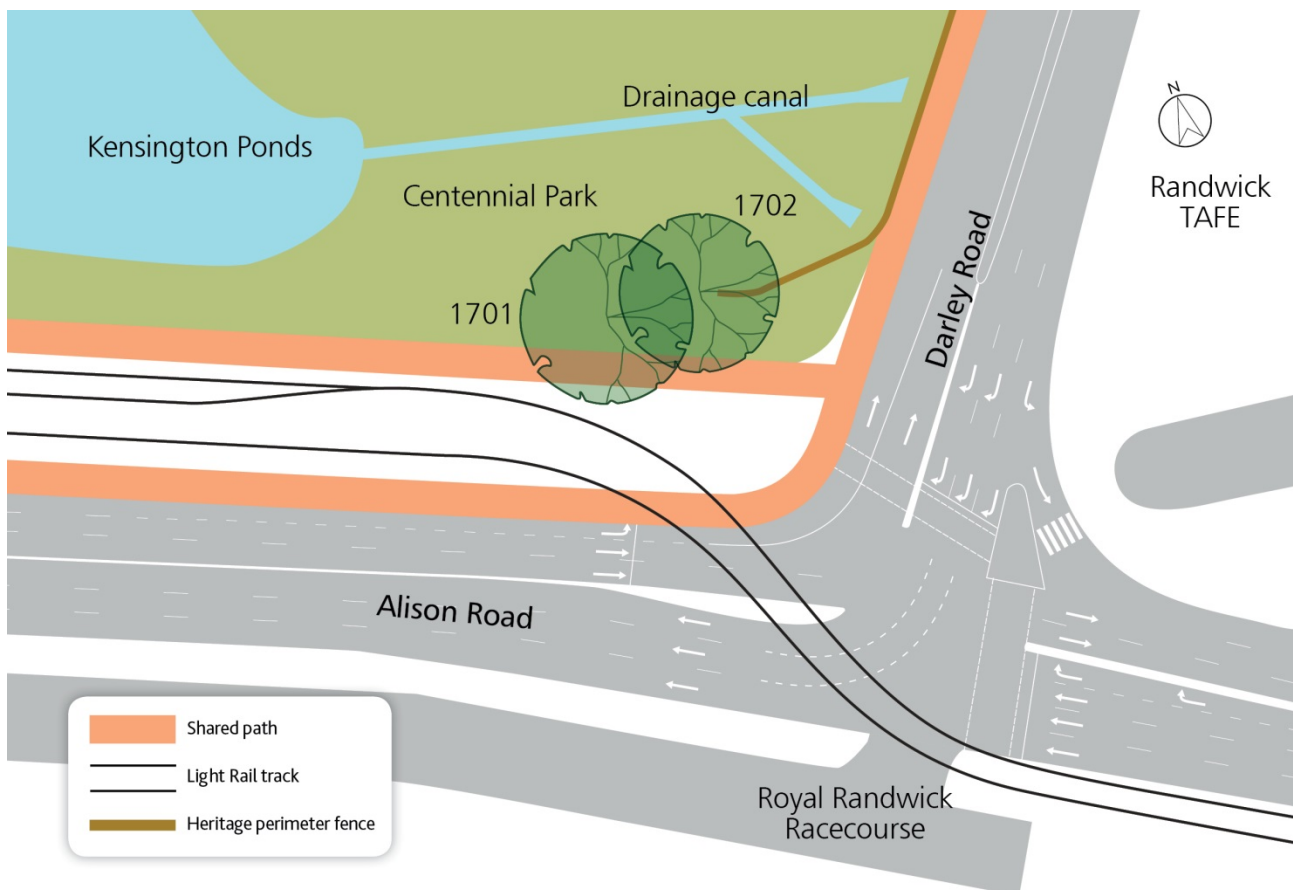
Proposed layout of Option one where the shared path runs perpendicular to Darley Road (not to scale).
